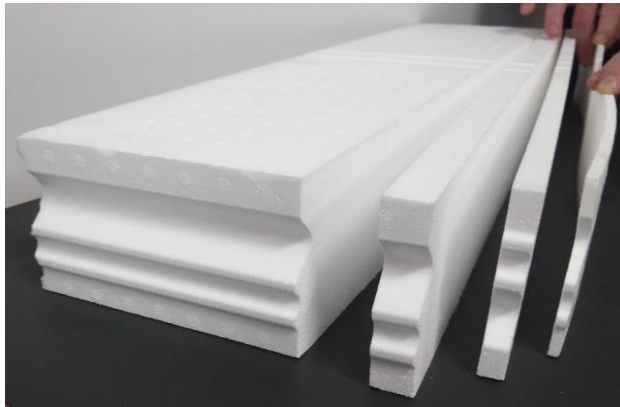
Ground beams made of cut CBM beams with various thickness Photo 18 – Example of a ground beam for HST windows
